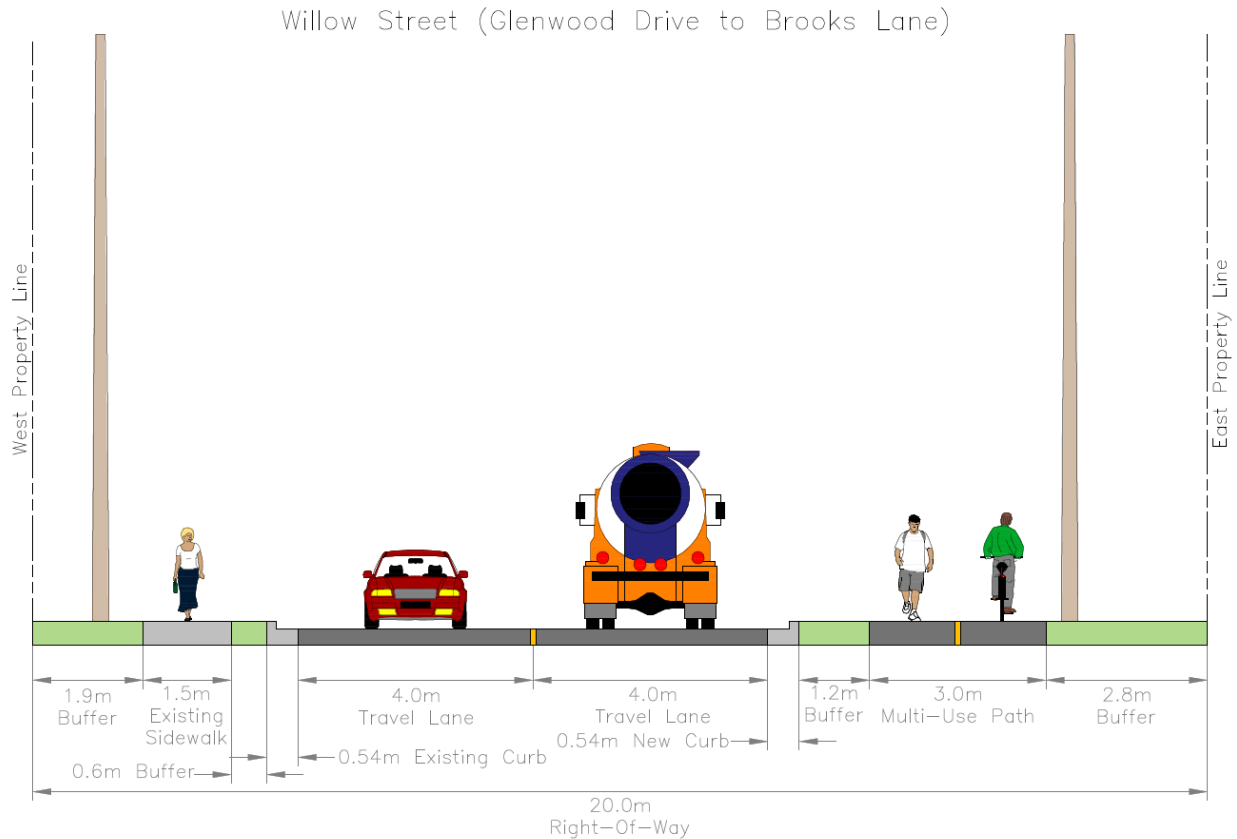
Willow Street between Glenwood Drive and Brooks Lane, Revised Cross Section
